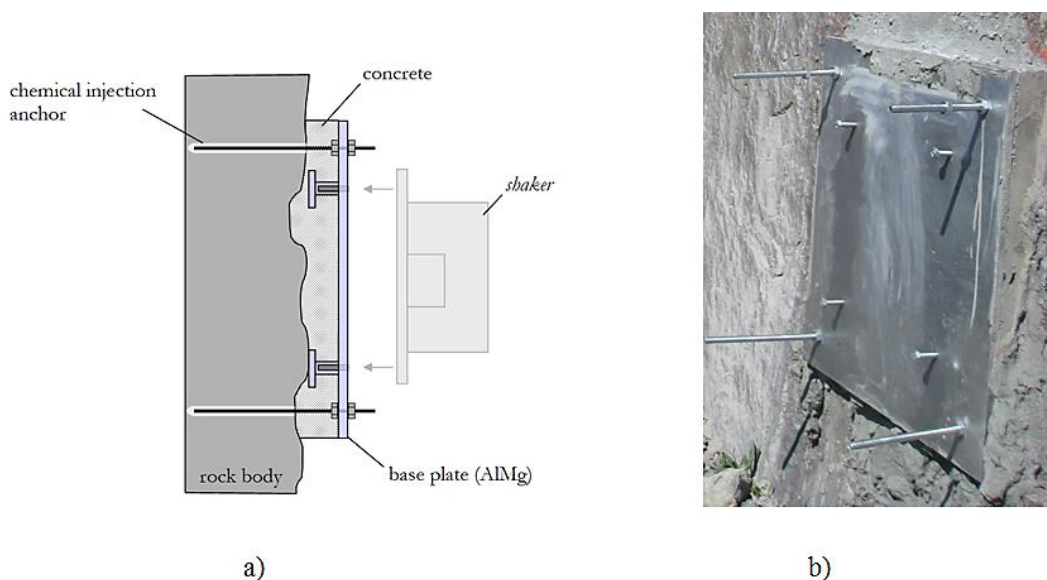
a) Sketch illustrating metal plate mounting to rock wall. b) Photograph of rock wall where a metal plate fixed with rock anchors and backfilled with concrete from Nittedal site.
